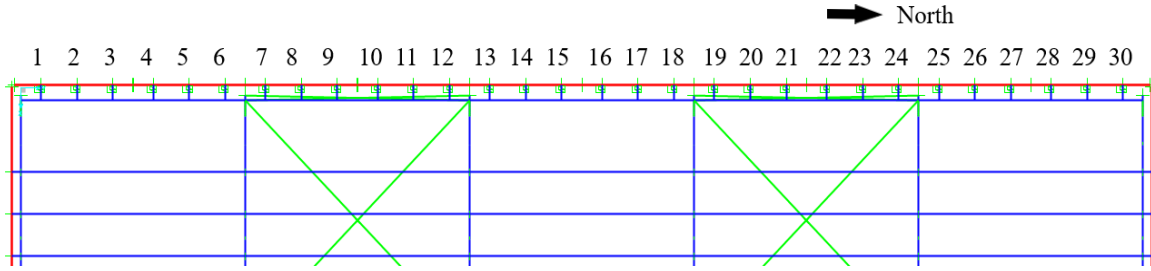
West Wall RFC Identification (Model 41 Plan View)
